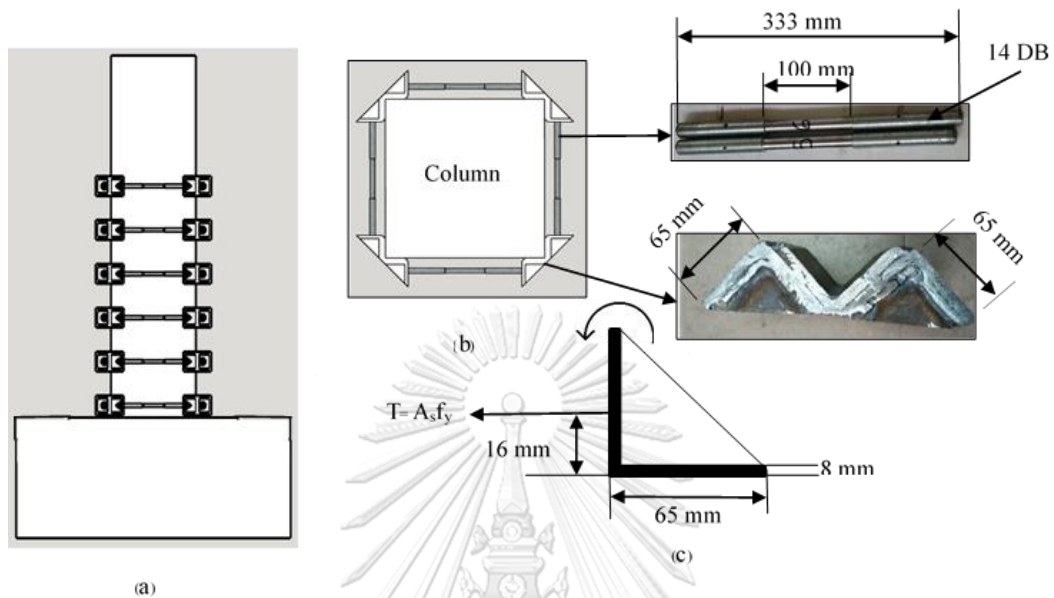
(a) Typical strengthened column (b) Steel rods and steel collars (c) Applying tensile moment of steel rods and moment capacity carried by steel angles and fastener
